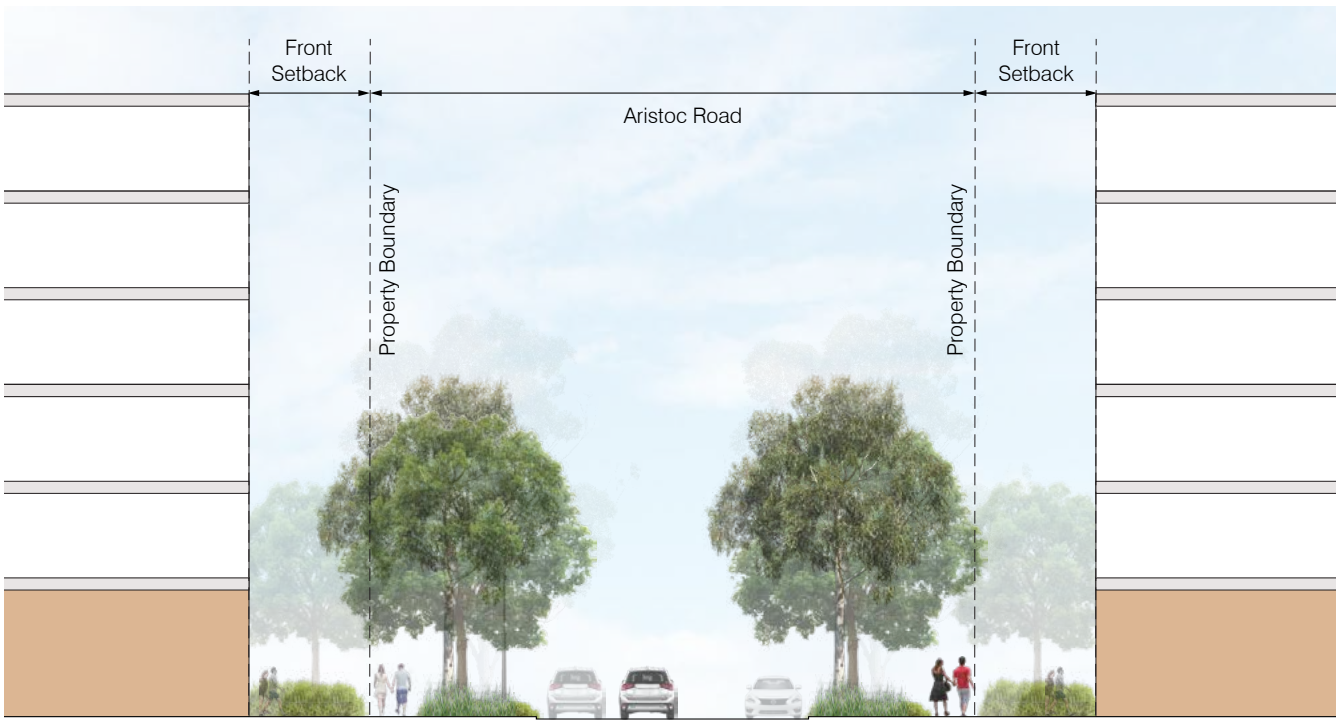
Section F - Illustration of potential typical section of Aristoc Road with built form interface
